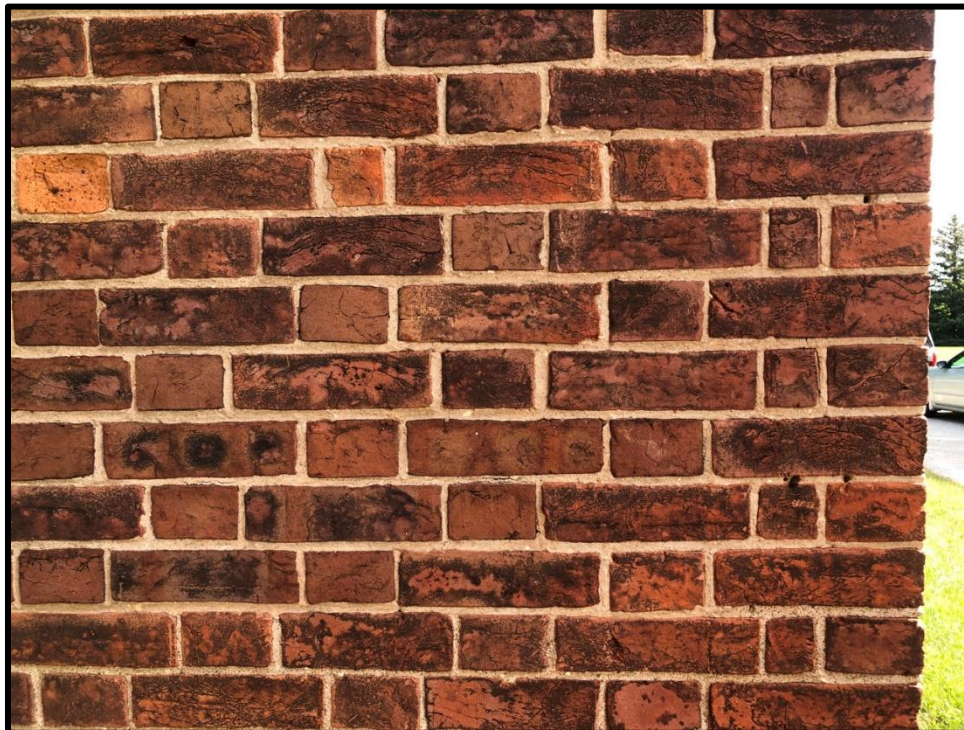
Brick Residence Brickwork Laid in Flemish Bond with English Corner Detail
